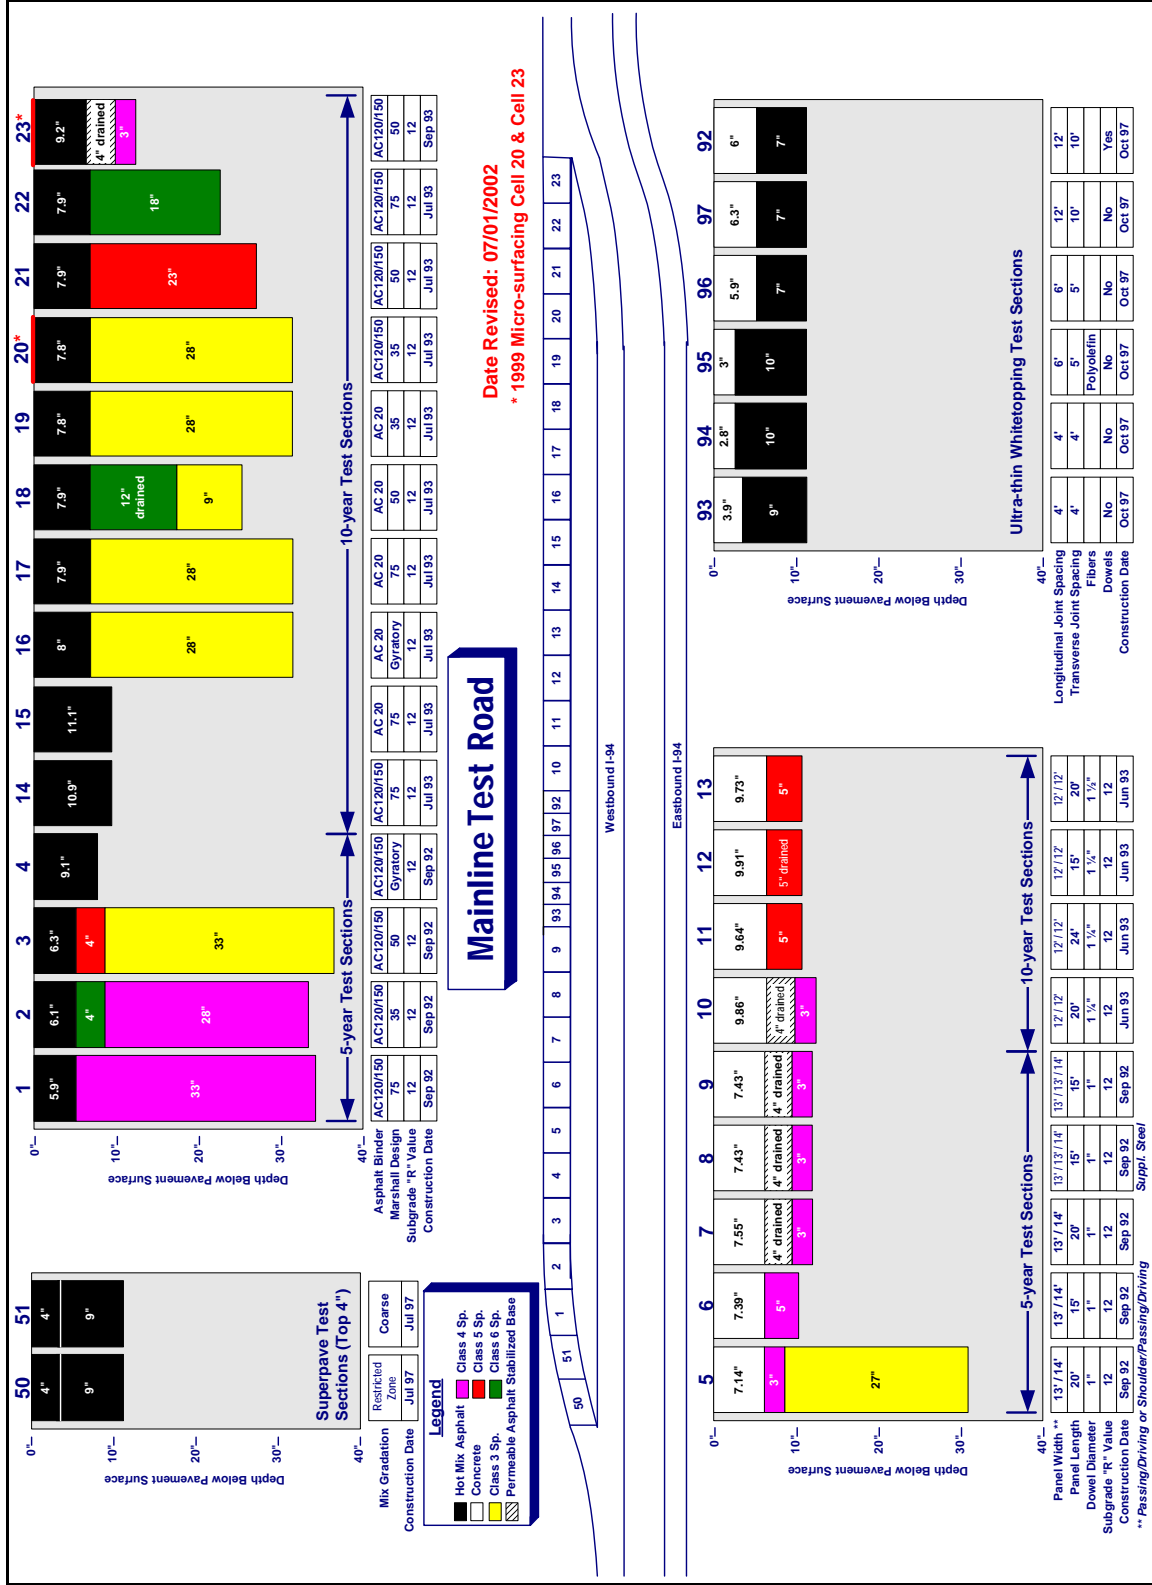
MnROAD TEST CELL LAYOUT (Mainline)
